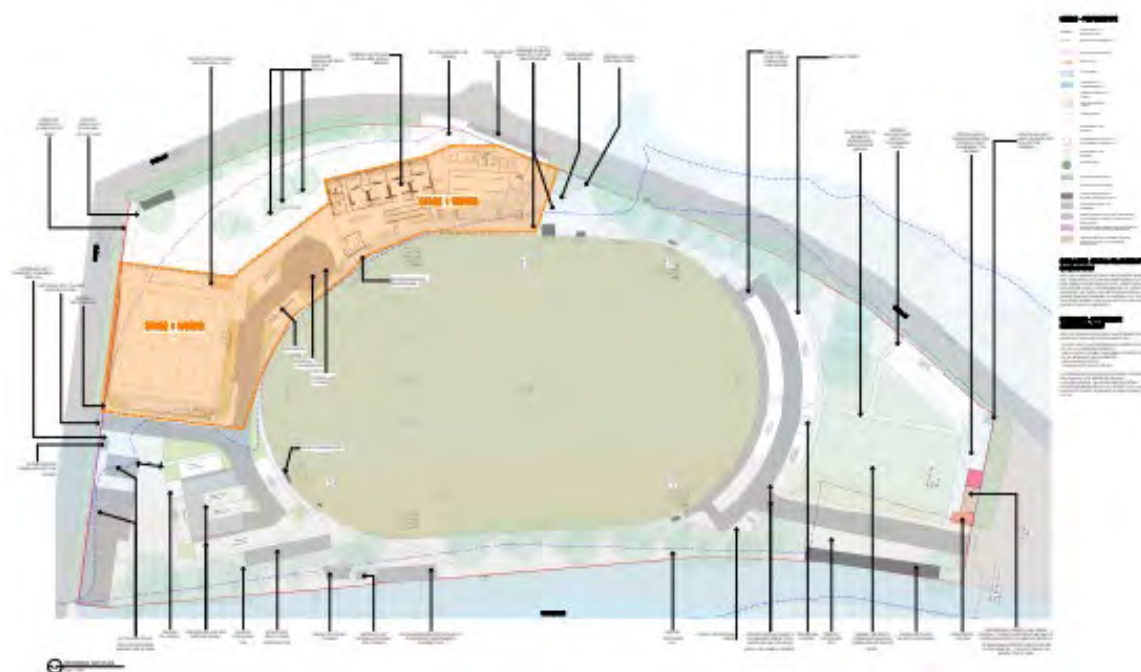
K20 Architecture proposed site plan. (Source: K20 Architecture Schematic Design SD02 P04, 2022)
